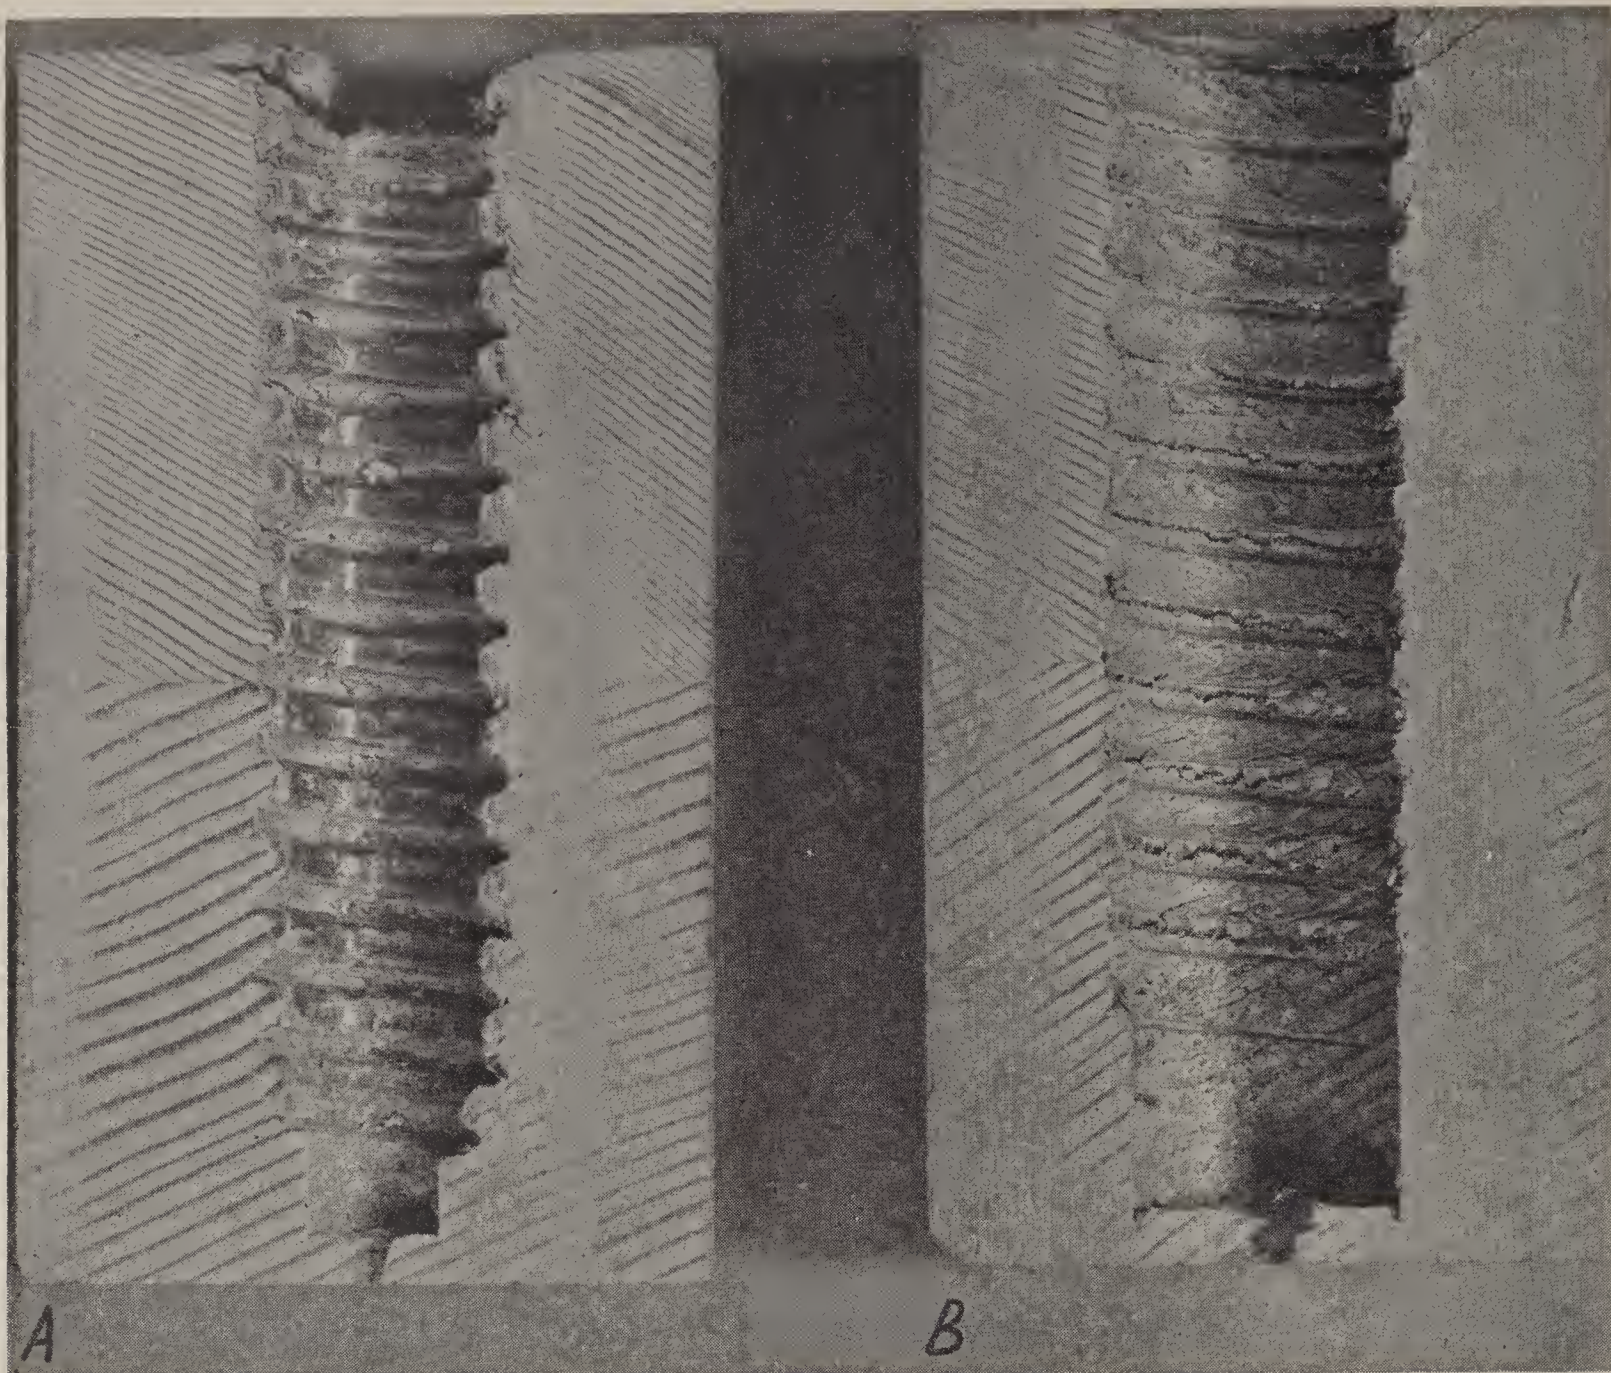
A, clean-cut, deep penetration of thread made by lag screw driven into lead hole of proper size; B, rough, shallow penetration of thread caused by oversize lead hole.
